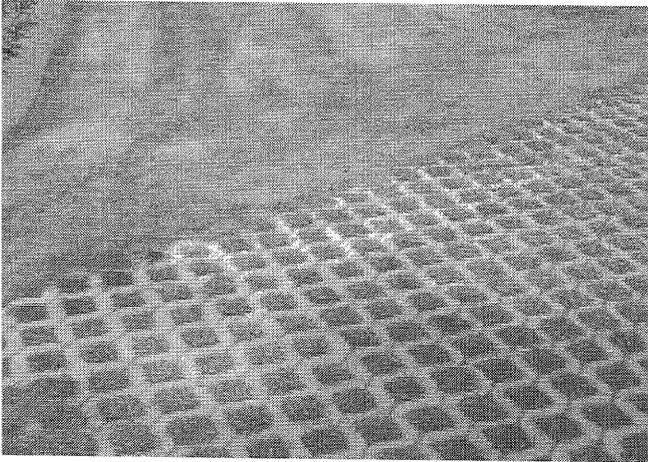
Concrete grid pavement substantially reduces runoff to levels approximating grass cover.
